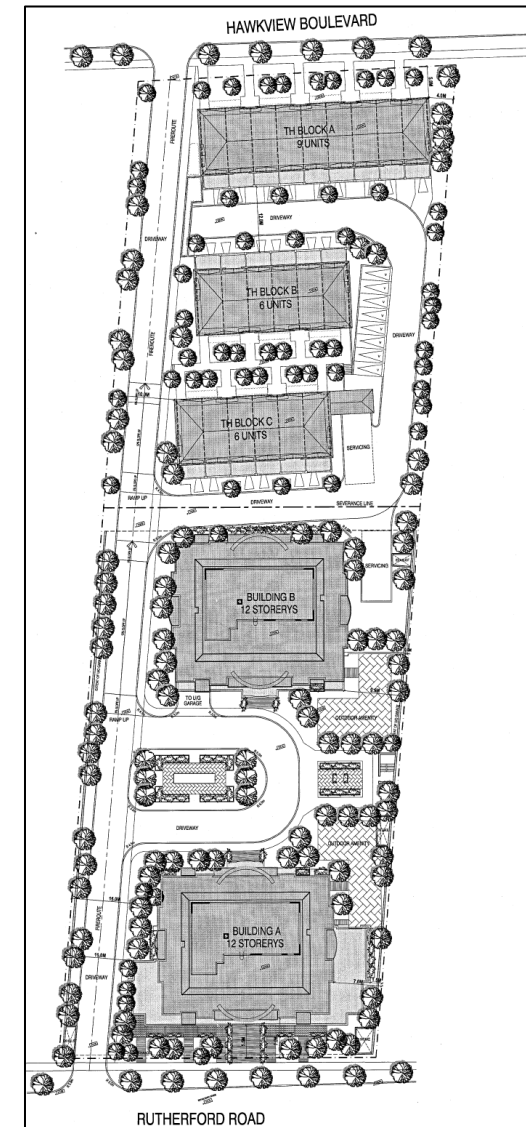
Original Site Plan (1<sup>st</sup> Submission, Dec., 19, 2011)
